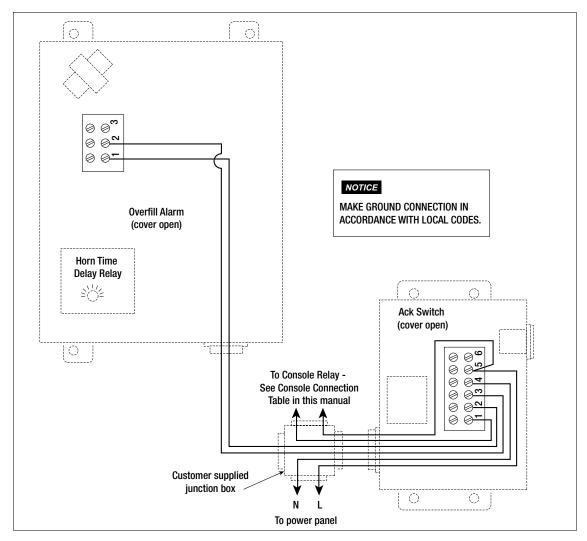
Overfill Alarm/Acknowledgment Switch wiring connections
